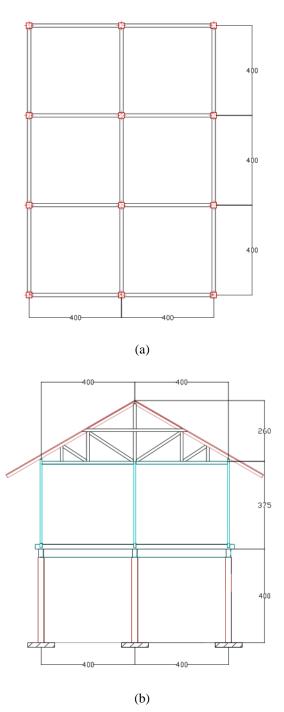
Design of coconut-timber house (a). Floor Plan; (b) Portal Frame
